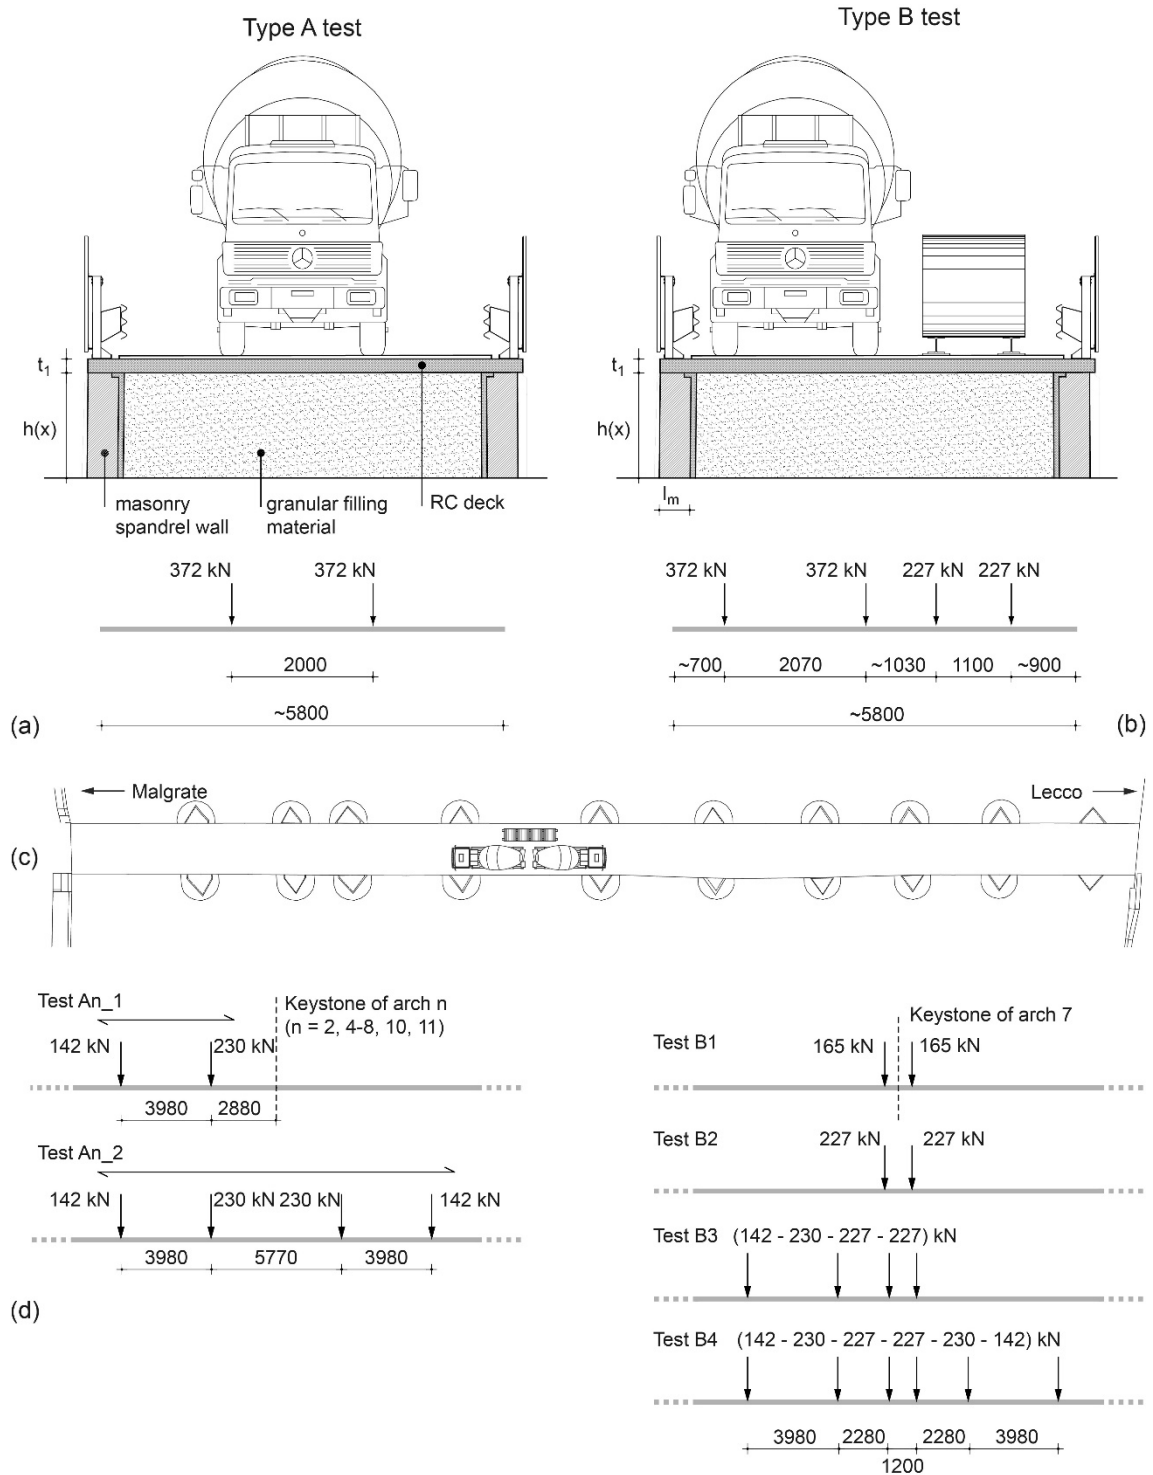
Cross bridge view and load point identification for (a) type A and (b) type B tests, (c) plan view of the bridge: loading scheme type B4 and (d) longitudinal position for the load scheme adopted (lengths in mm).
